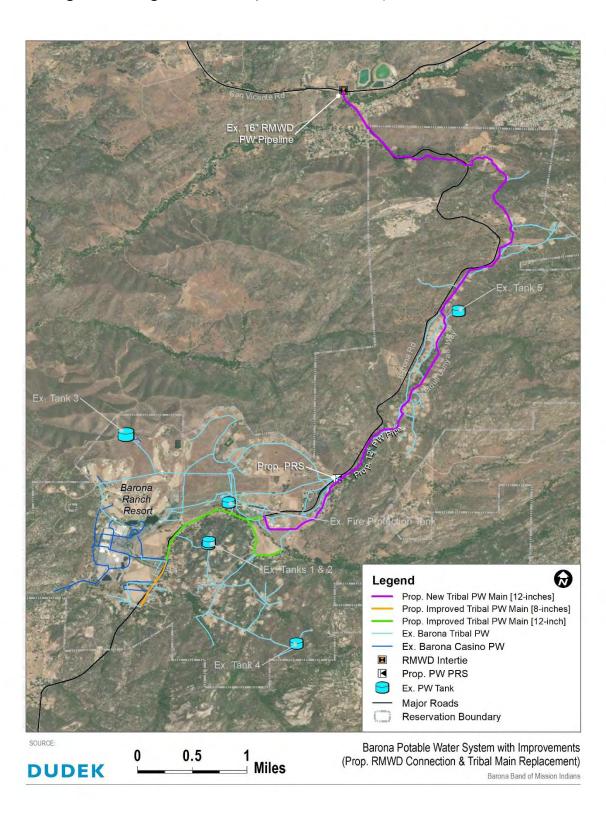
Existing Potable Water System with 12-inch Pipeline Connection to RMWD
